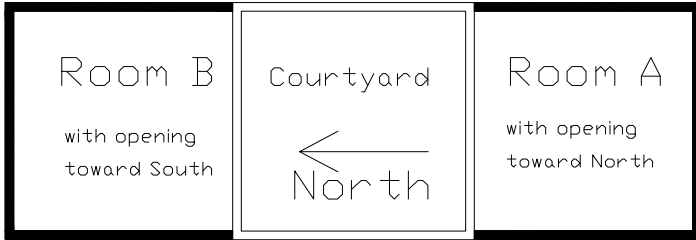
Plan of the Courtyard and simulated rooms (A) with opening toward North and (B) with opening toward South
